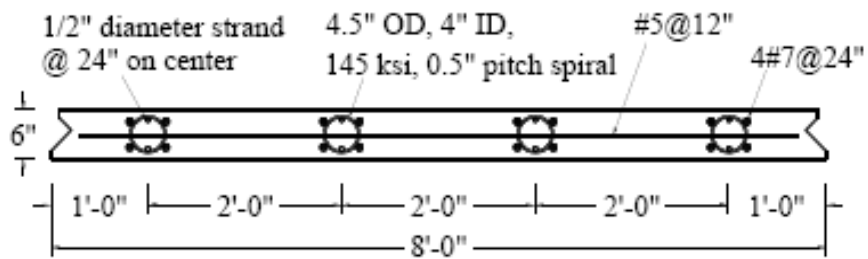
Cross Section of Typical Prestressed NUDECK Panel
